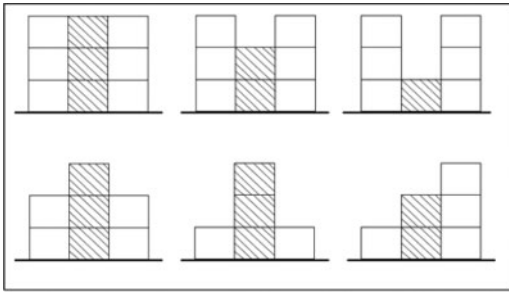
Possible in elevation configurations of a structural unit inserted into a building aggregate.
